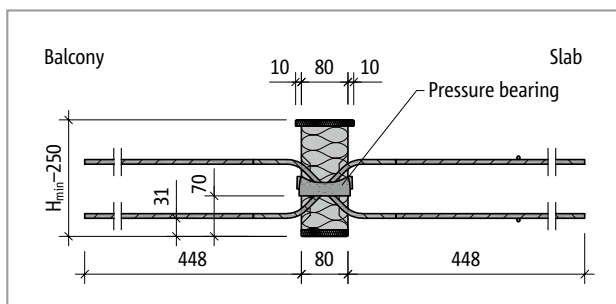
Schöck Isokorb® T type Q-VV6: Product section
